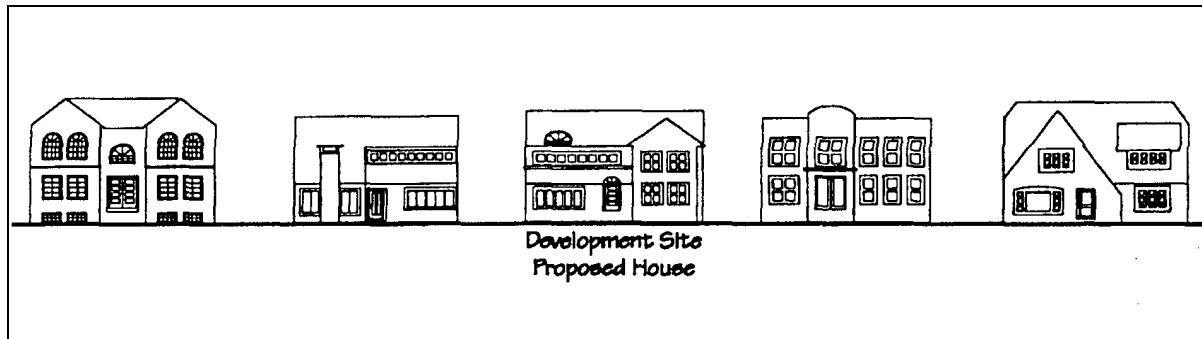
Streetscape Example (2) Showing Window and Door Patterns and Elements
